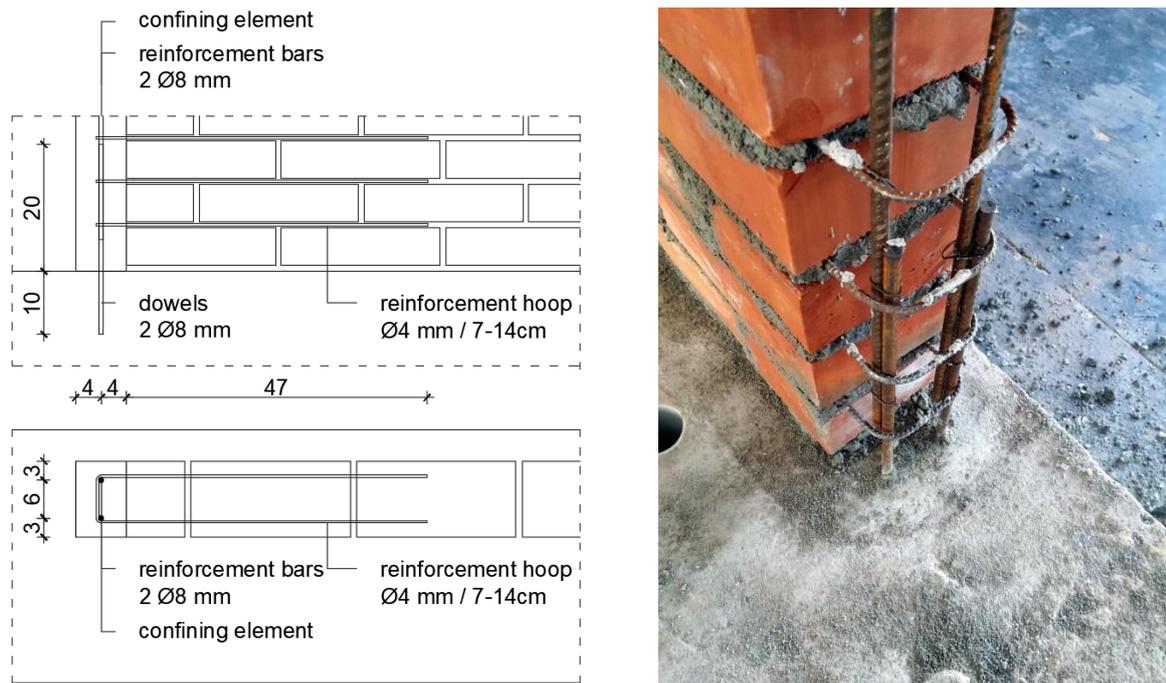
Confining element anchorage and reinforcement details in the cross-section (left below), in elevation (left above) and in structure (right)
